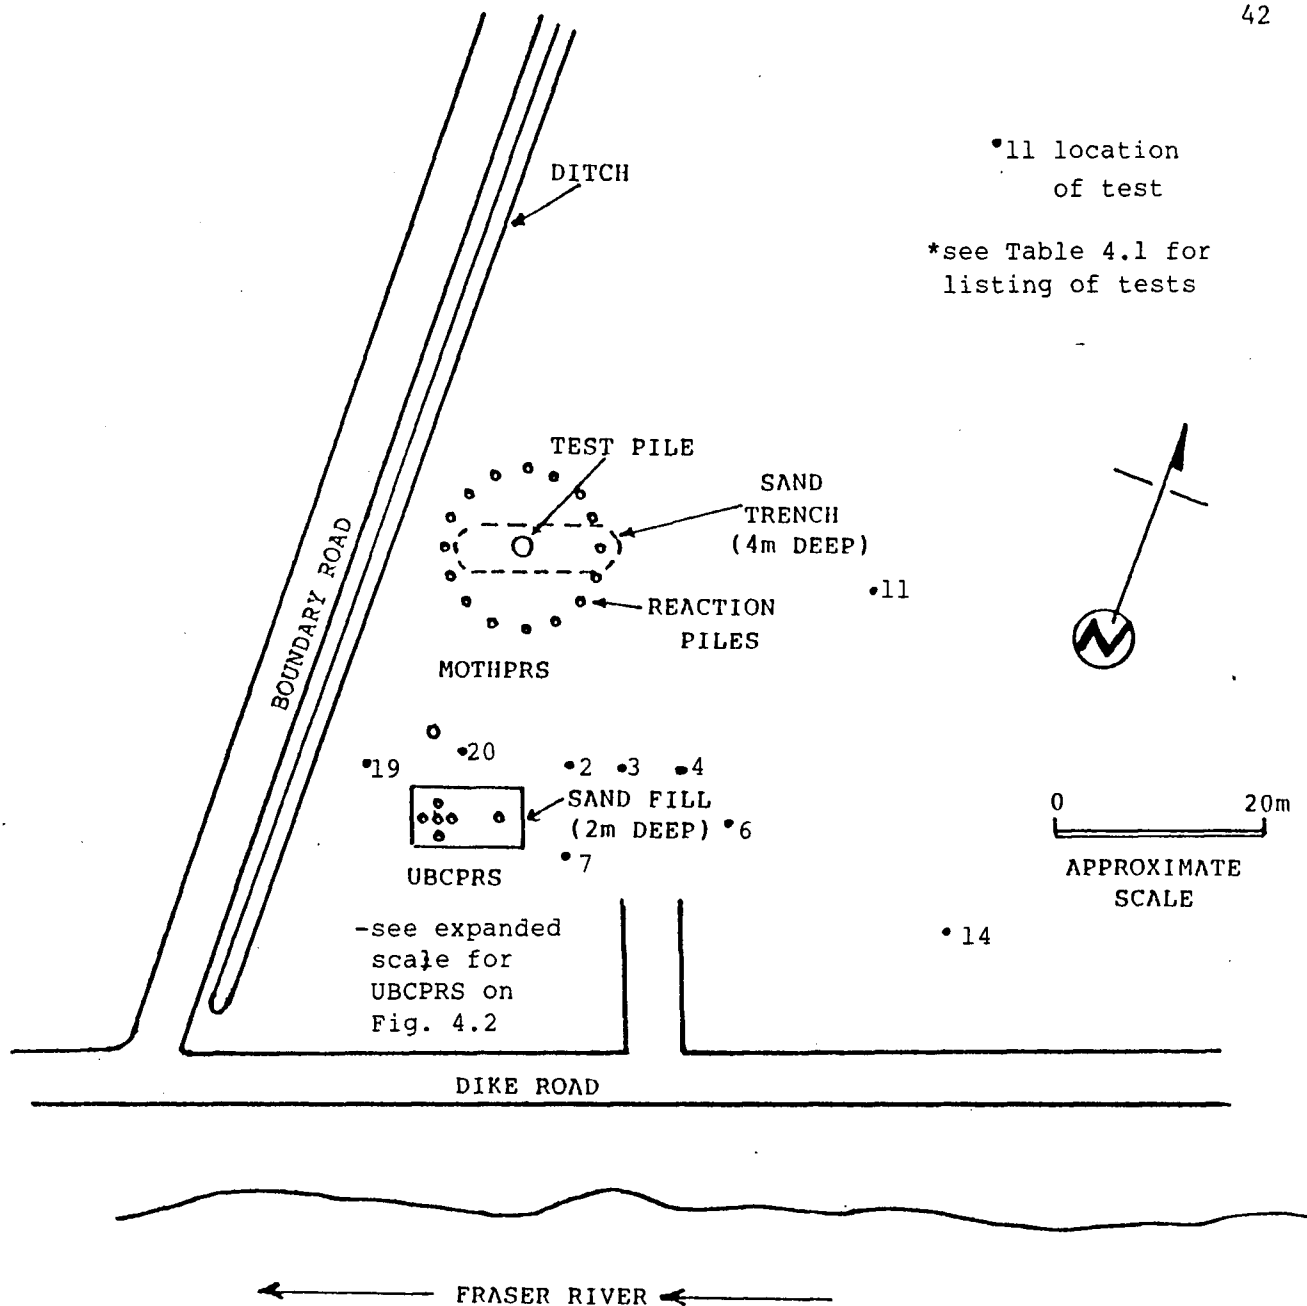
LOCATIONS OF IN-SITU TESTS PERFORMED AT PILE SITES
